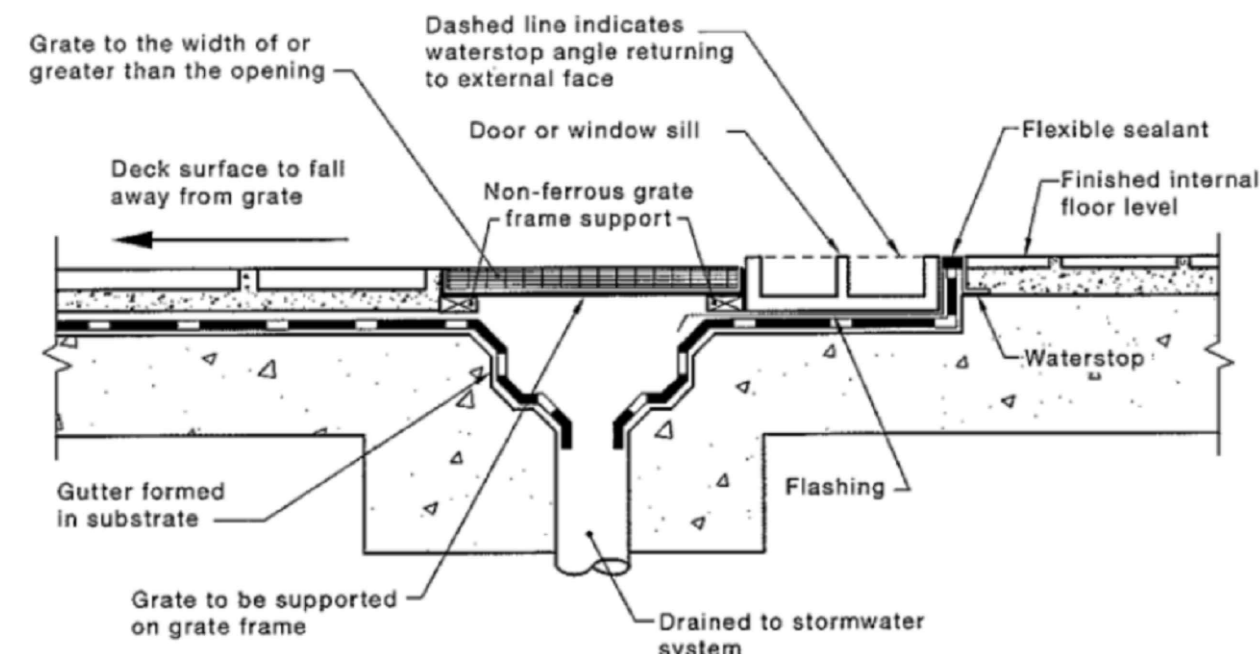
TYPICAL DETAILS OF MEMBRANE TERMINATION AT WALL OPENINGS WHERE THE INTERNAL AND EXTERNAL FINISHED FLOOR LEVELS DO NOT ALLOW FOR AN UPTURN
